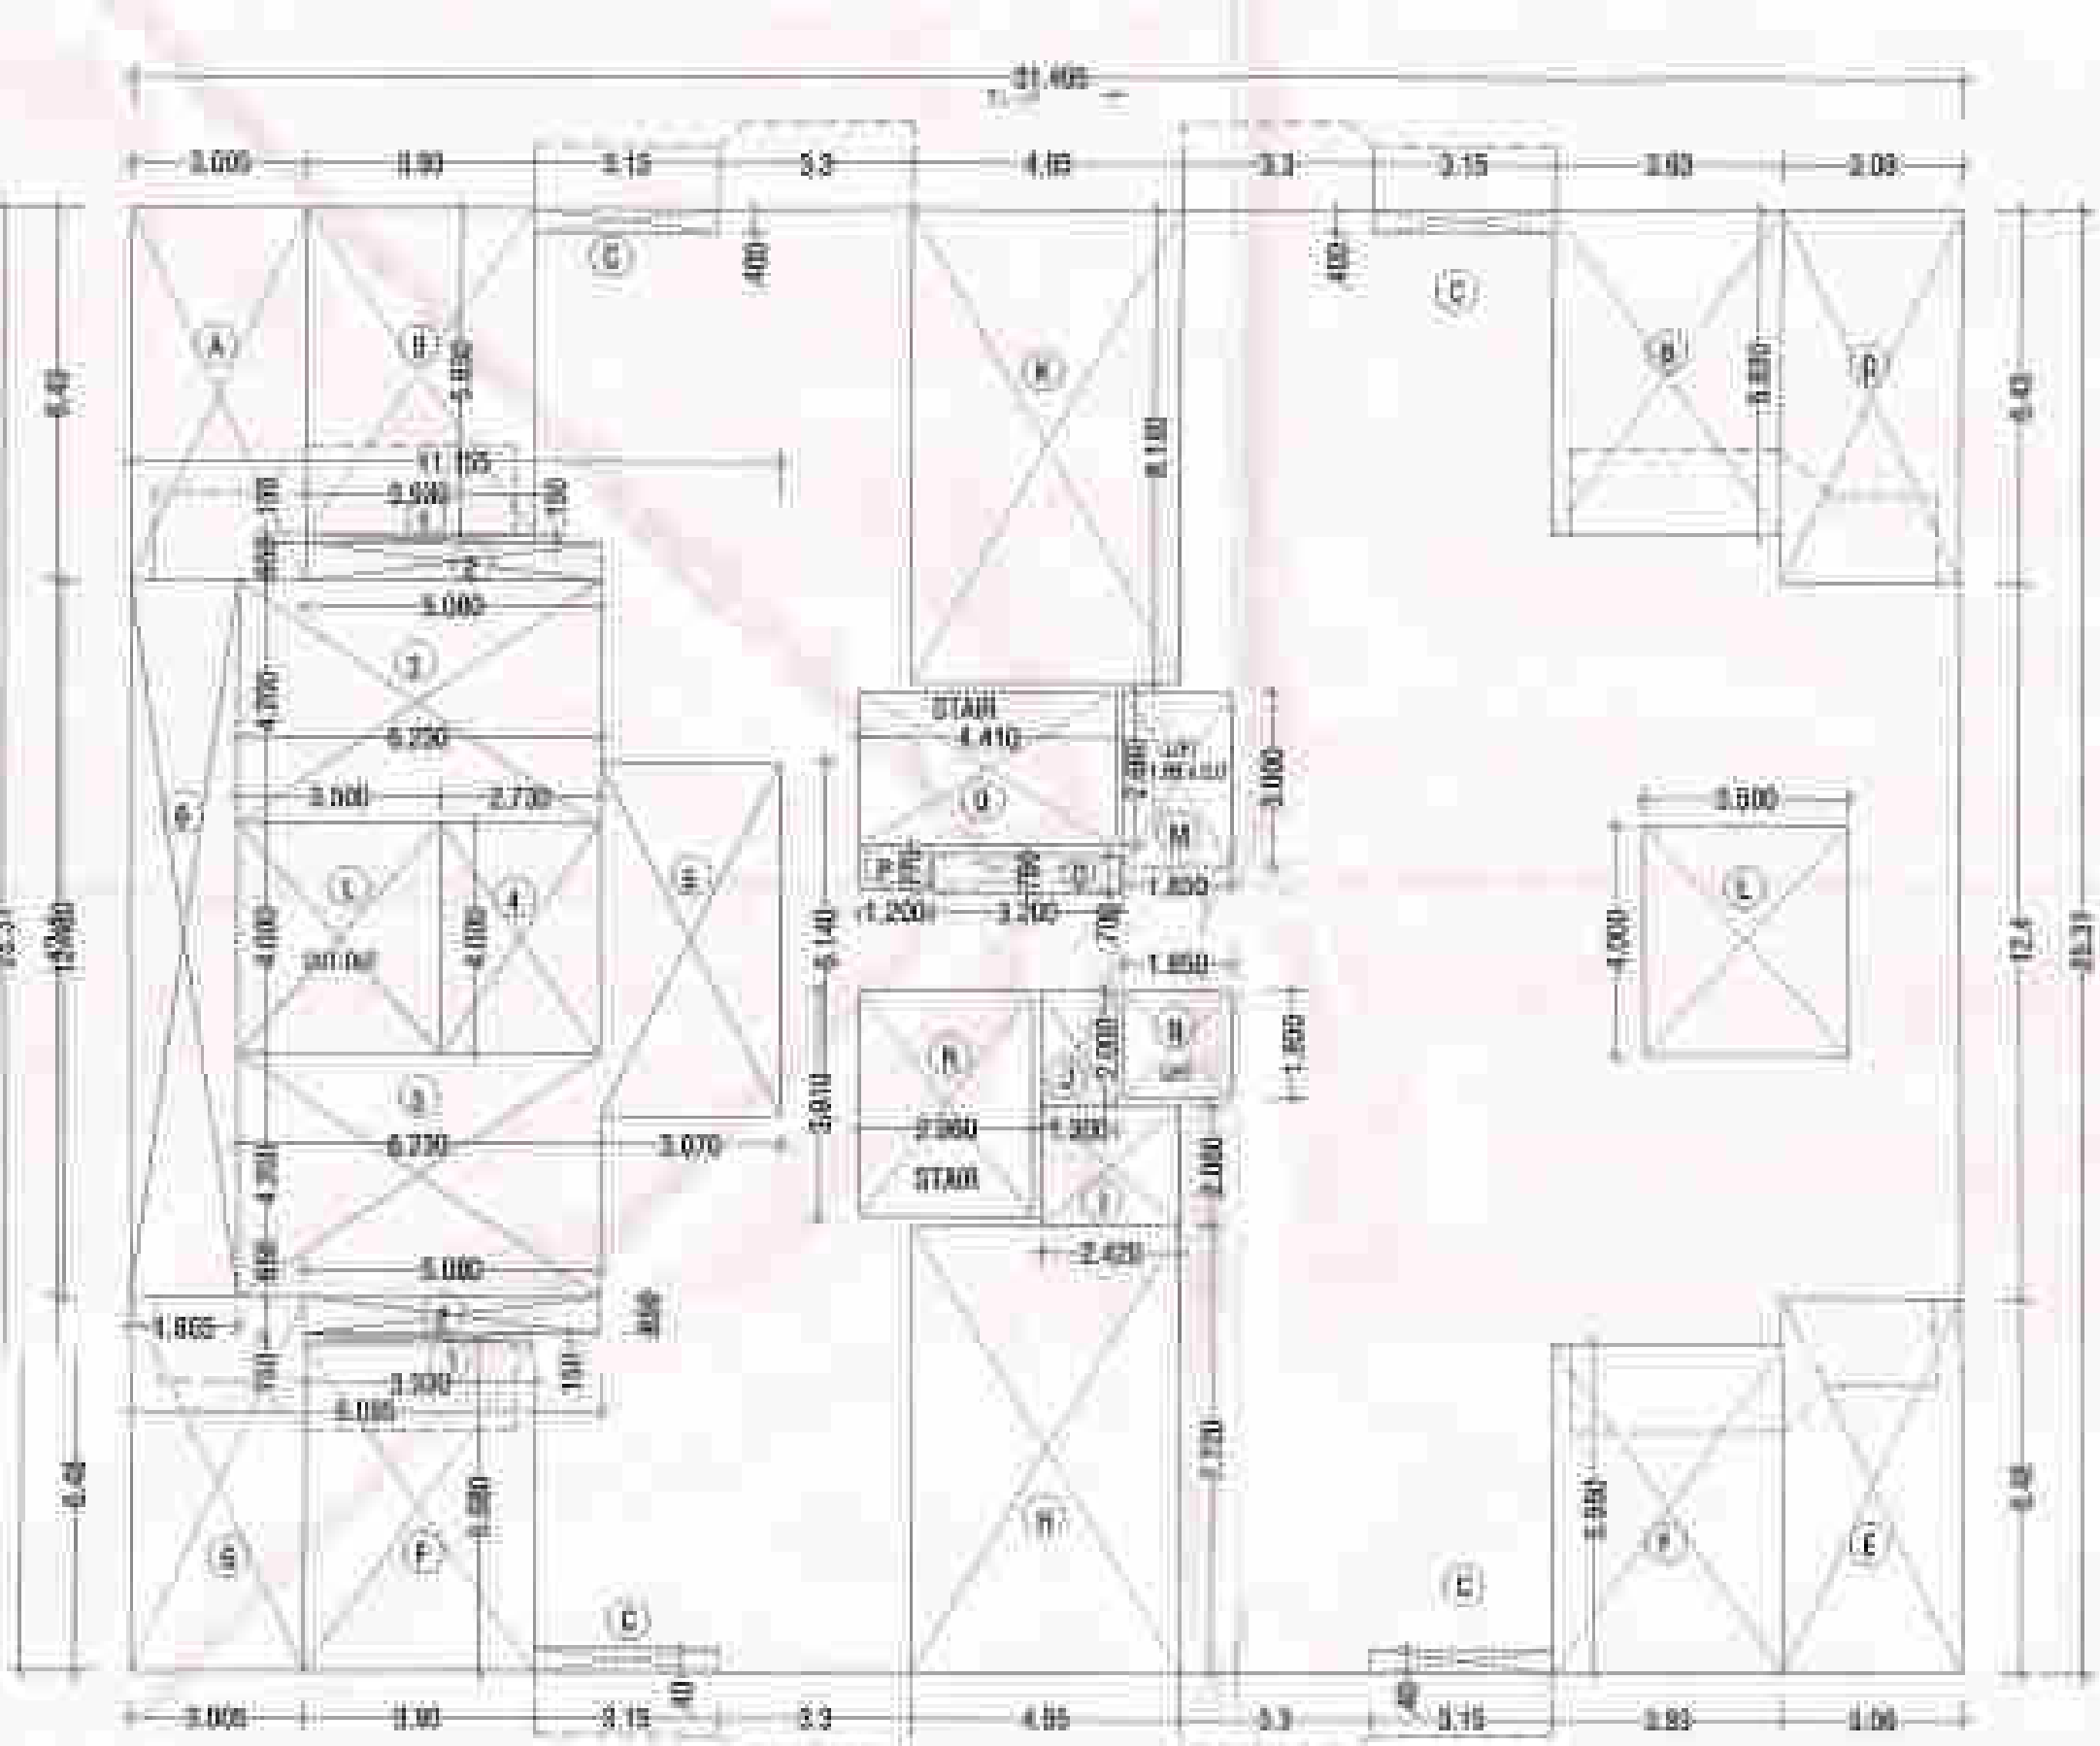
DETAIL OF TYPICAL FLOOR COVD. AREA (1st. To 7)
